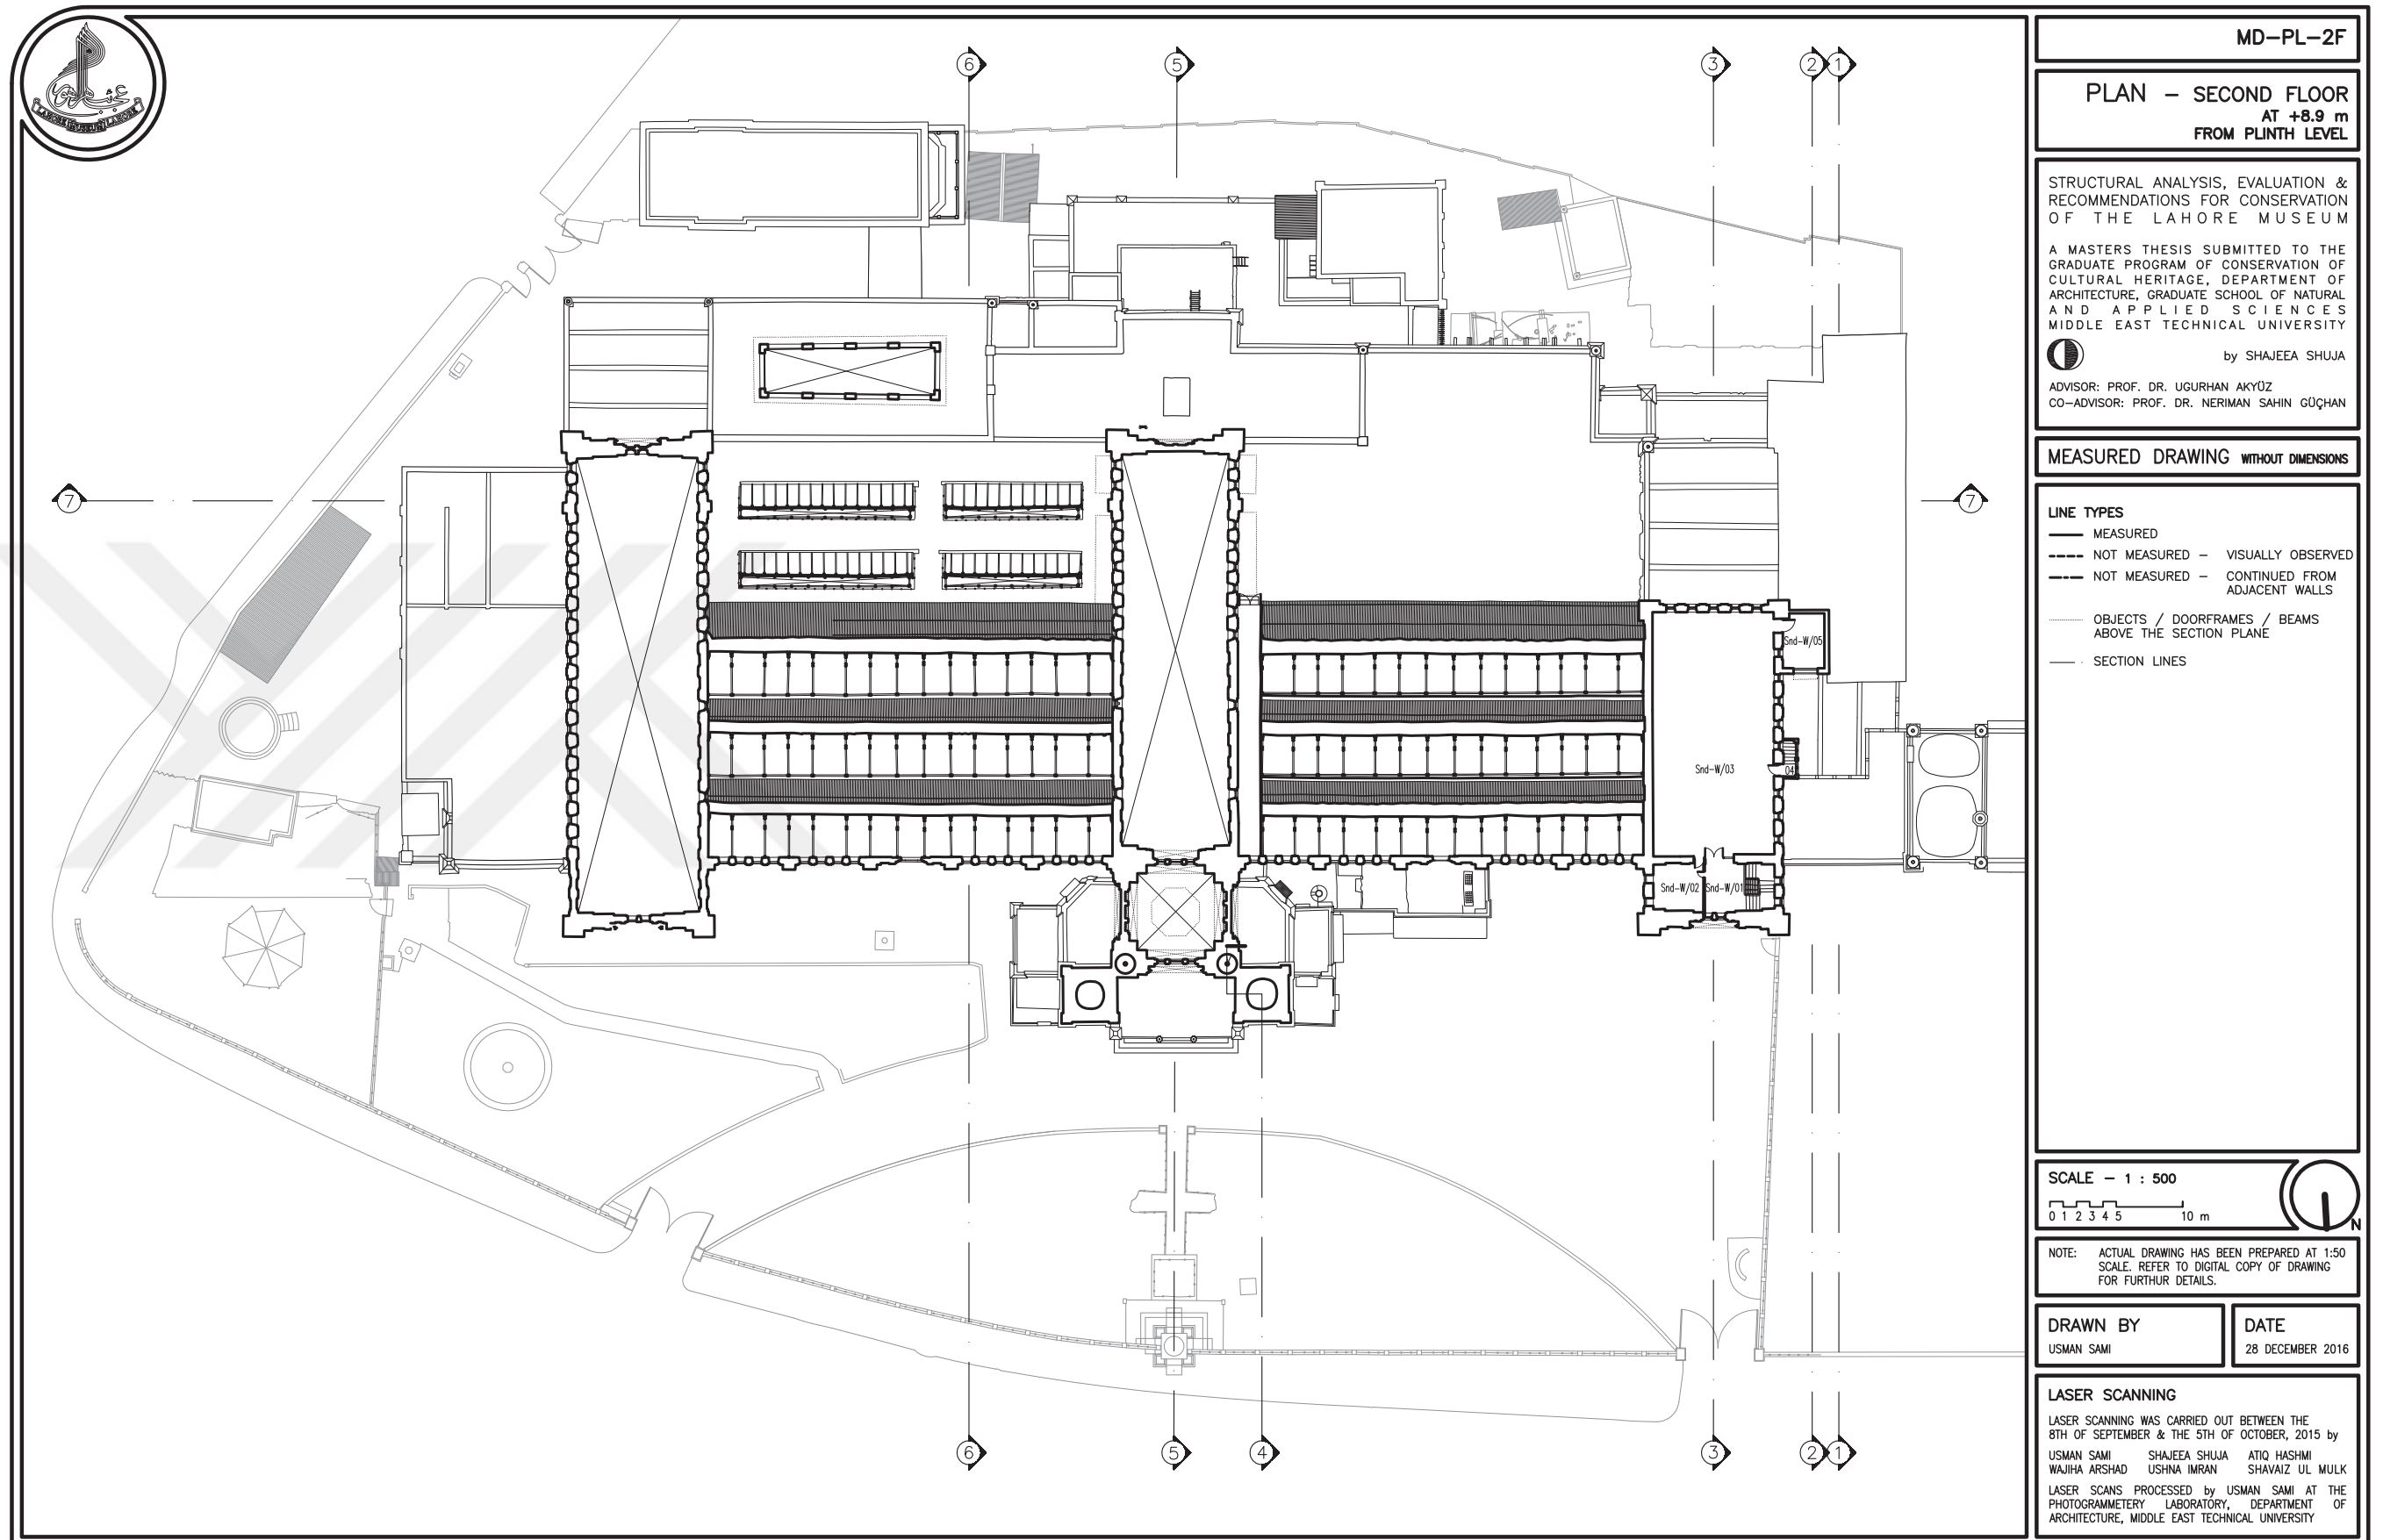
MD-PL-2F – Measured Drawing – Plan – Second Floor (2016)
